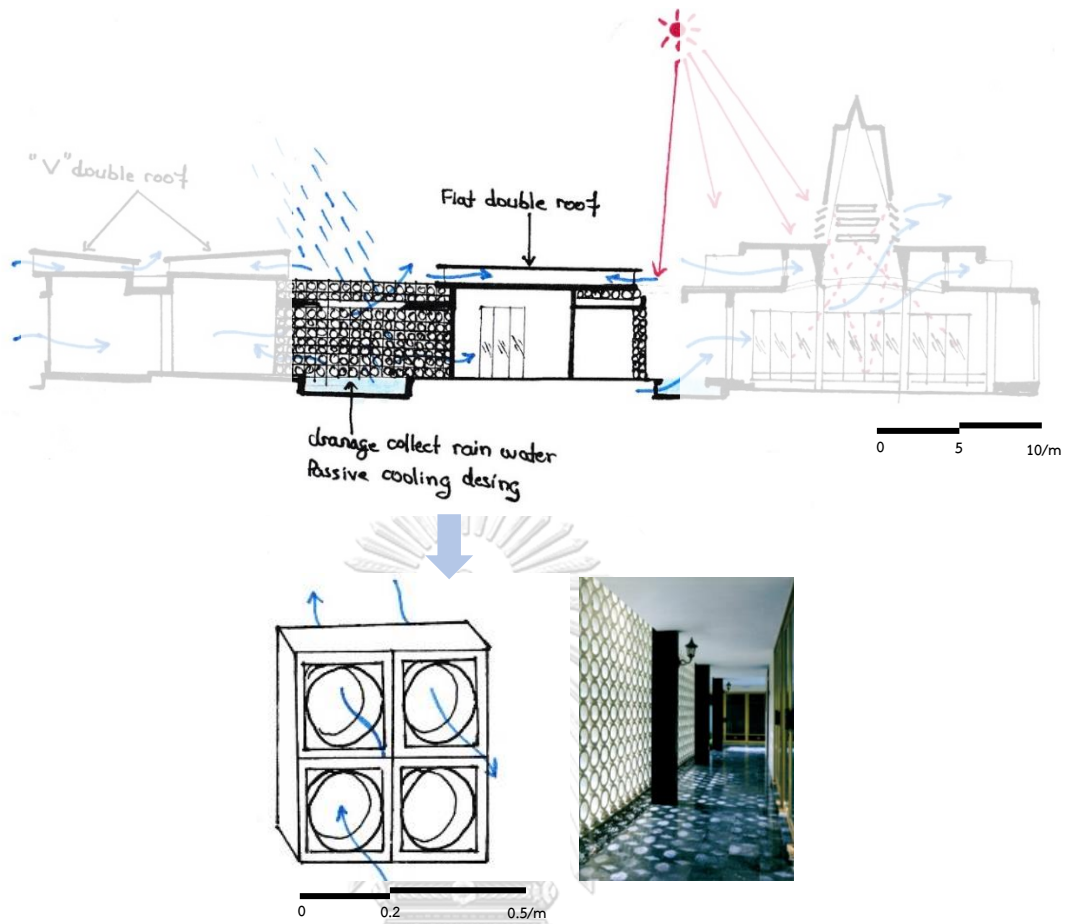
53 . Diagram drawing section showing the concrete wall and circular ground design that allow gentle and dappled light and ventilation
